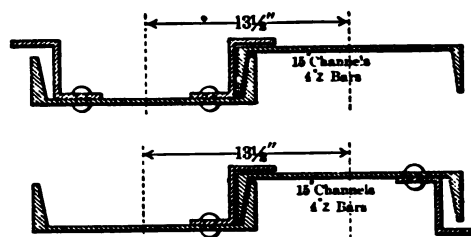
FARGO'S STEEL SHEET-PILING.
